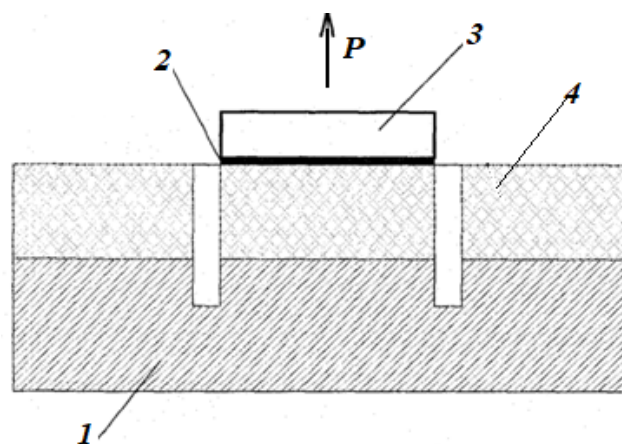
Pull test scheme: 1—base concrete (bearing structure); 2—polyepoxy glue; 3—metal disk; 4—waterproofing (repair) material; P is the direction of tension (application of the load generated by the test device).
